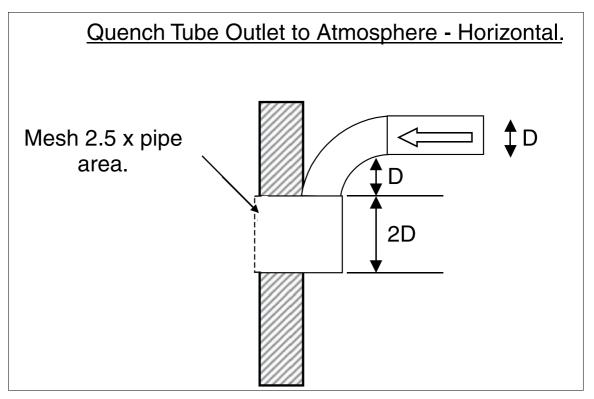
Example of horizontal quench tube venting to the outside, flush with wall
